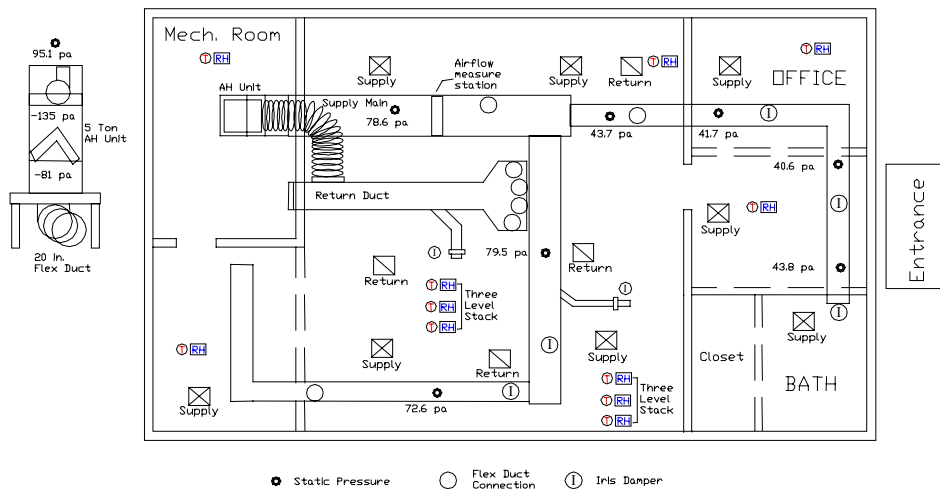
Floor Plan of the Attic of the Building Science Lab Building Showing Sensor Locations
